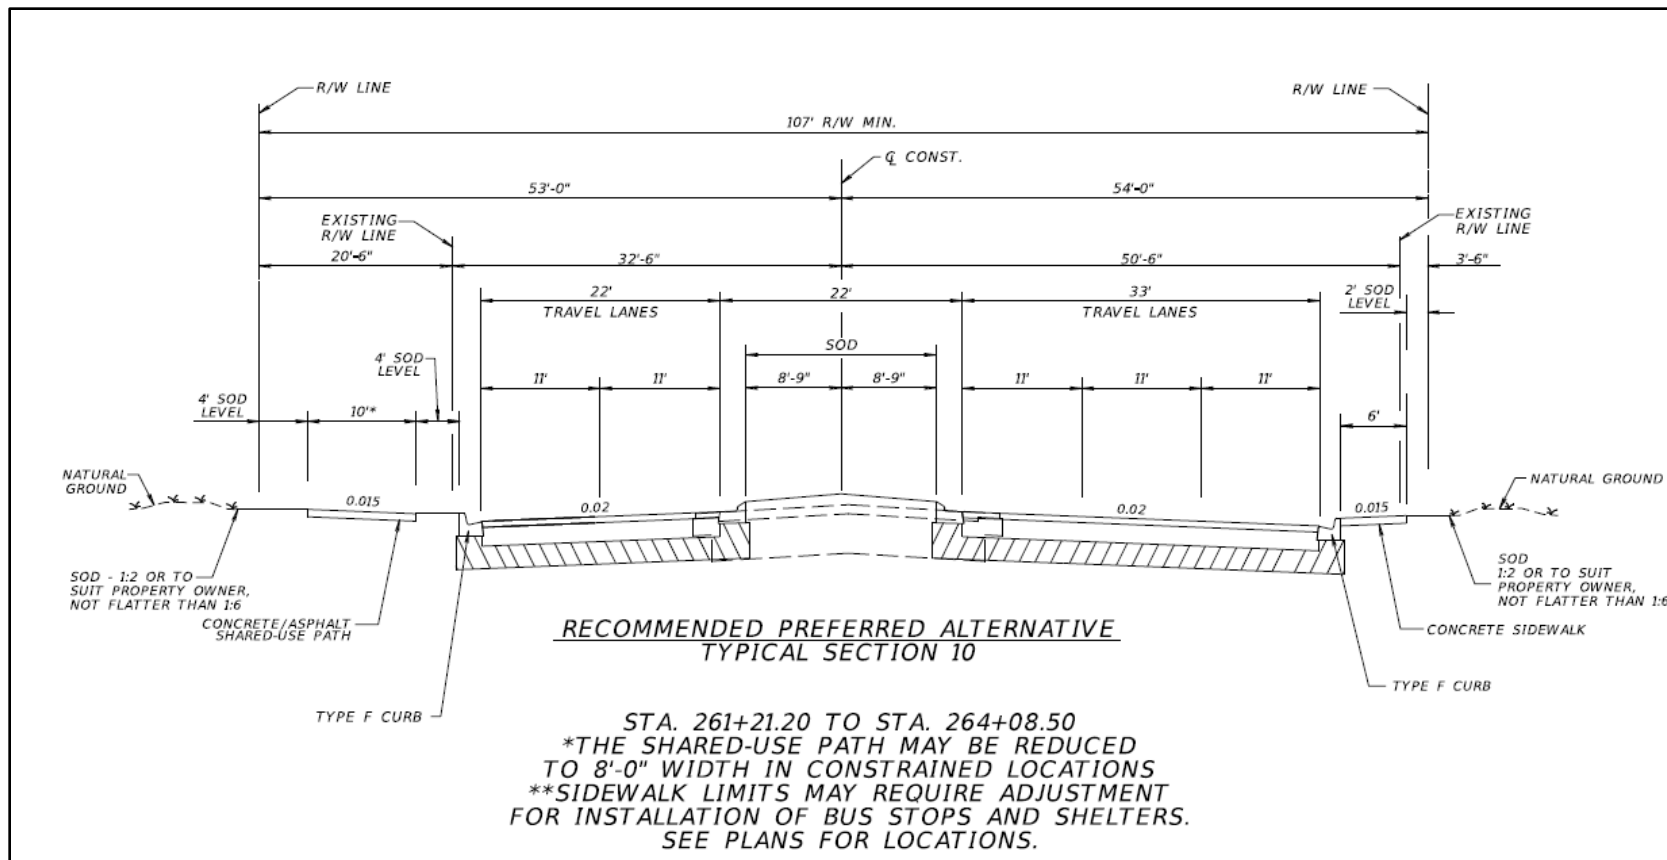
Representative Preferred Alternative Typical Section – West of Plaza Shopping Center
